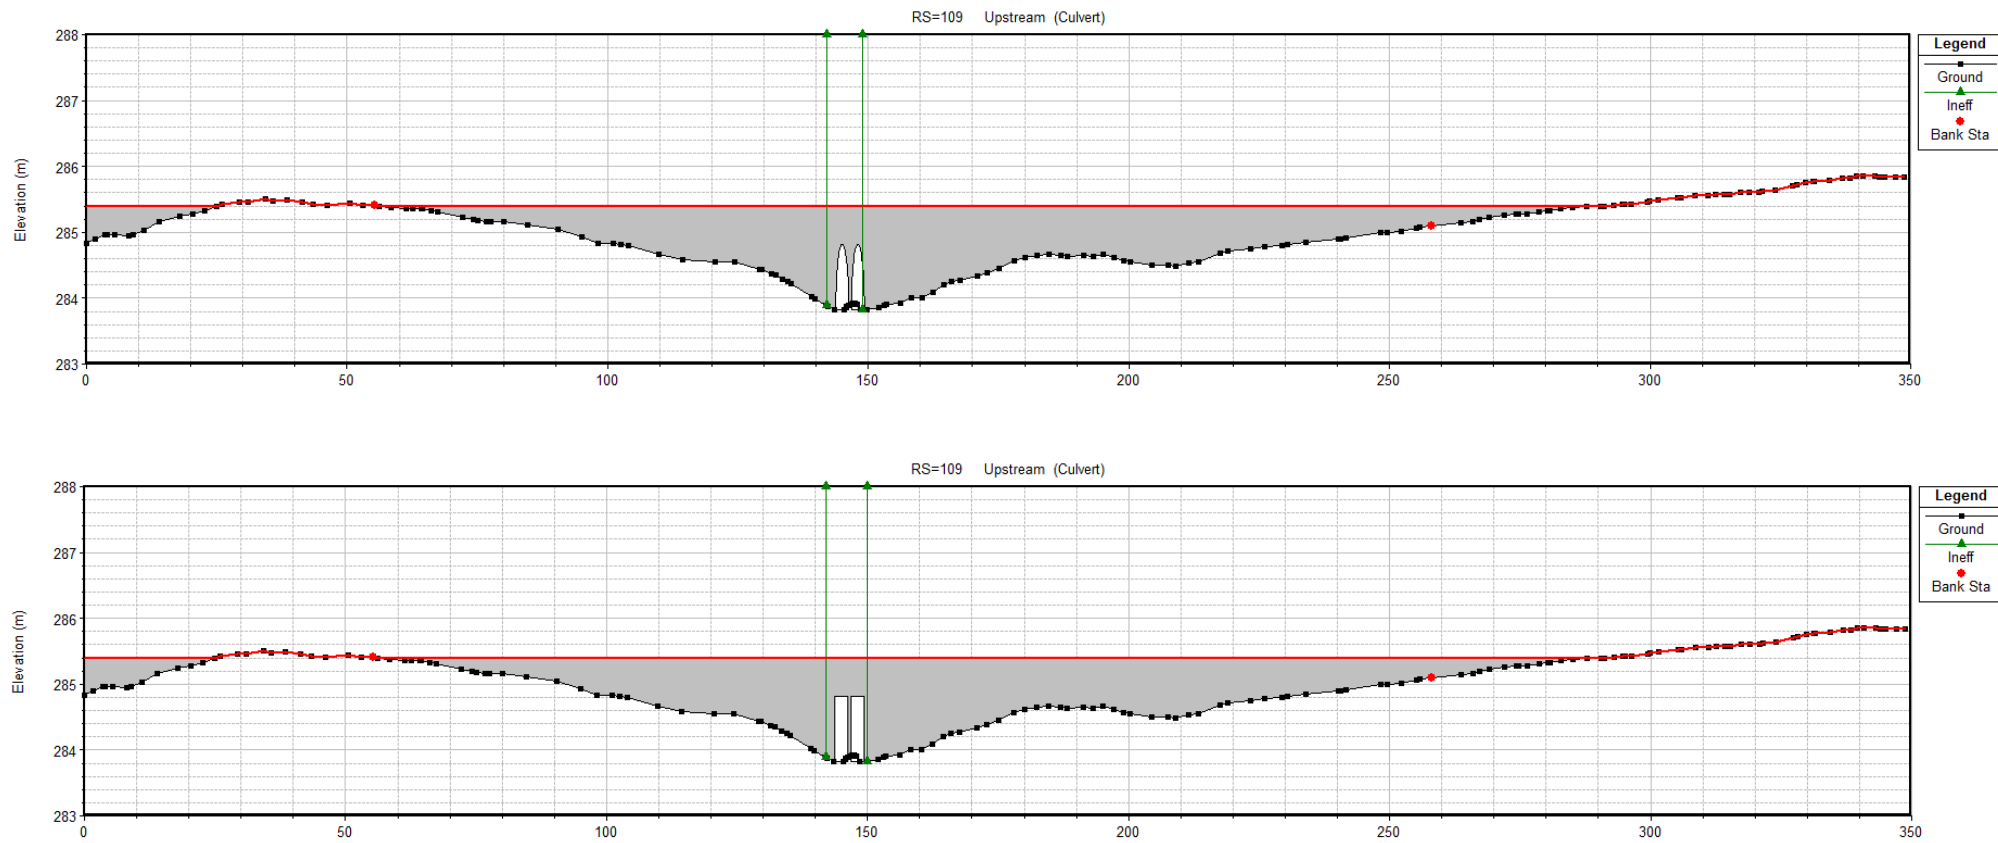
Cross-section along Proposed Culvert, for Box and CSP culverts
